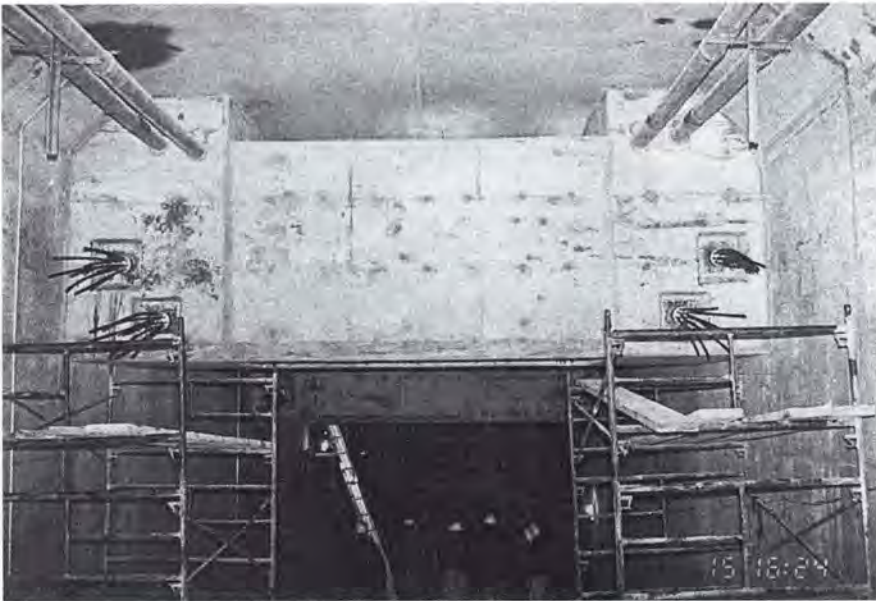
Anchorage Blocks No. 3 at 27.4 m (90 ft) from interior support.
